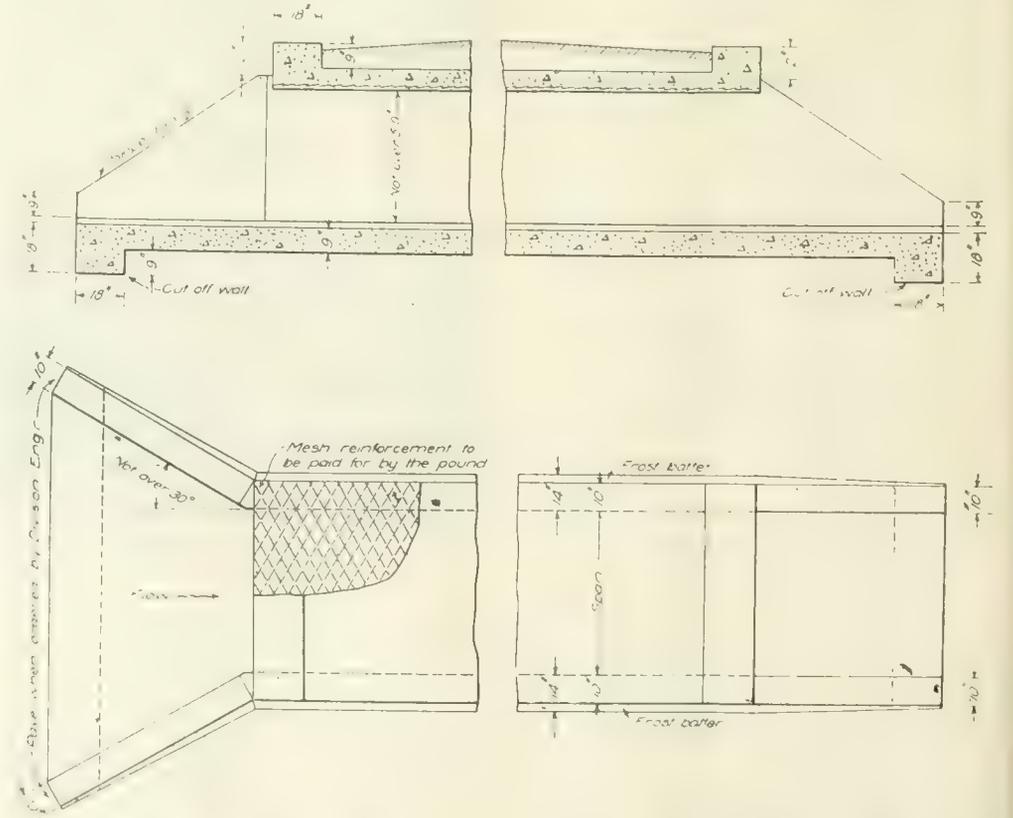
Plan and Cross Section of Box Culvert Having Frost Batter on Side Walls.
